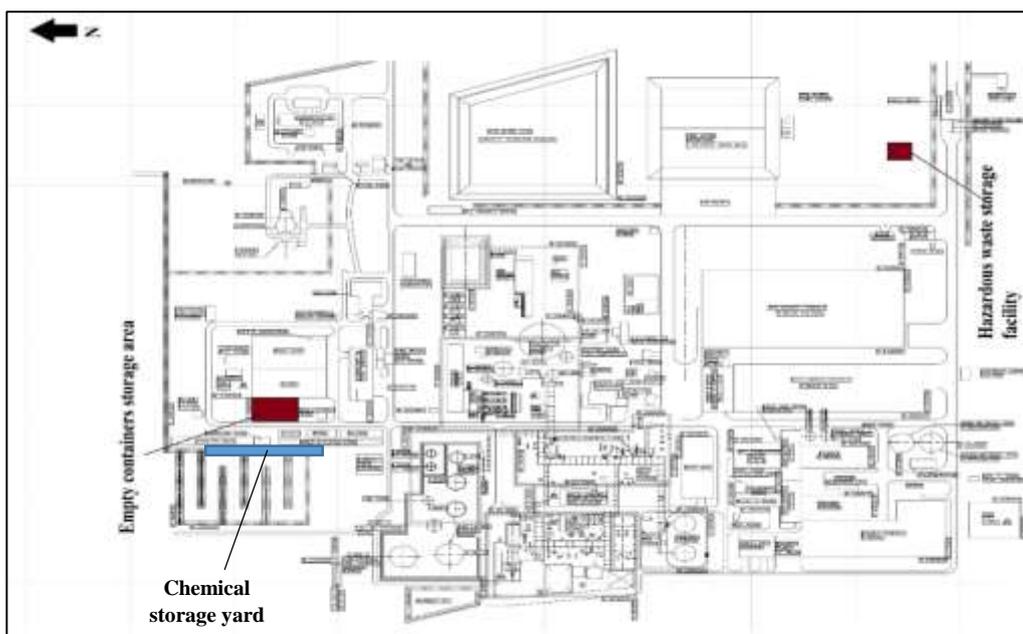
Location of hazardous waste storage facility and empty containers storage area at MFL
